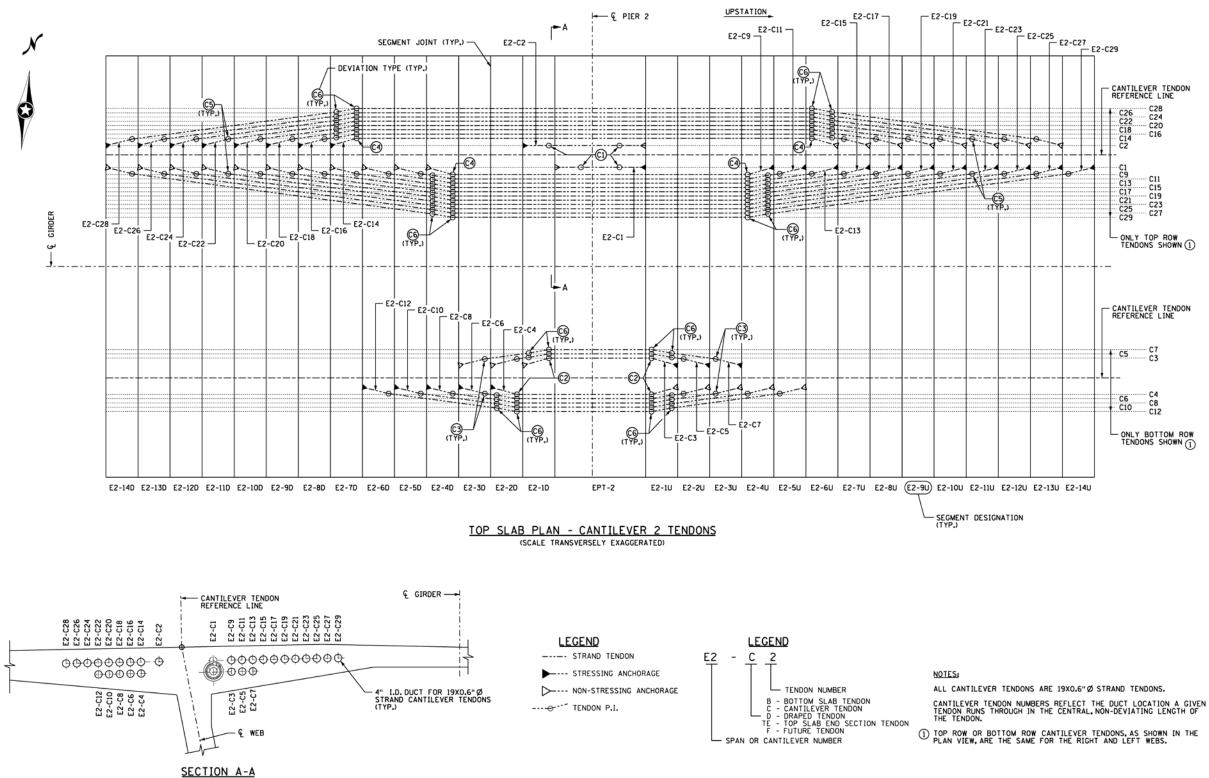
Eastbound Cantilever 2 Cantilever Post-Tensioning Layout
